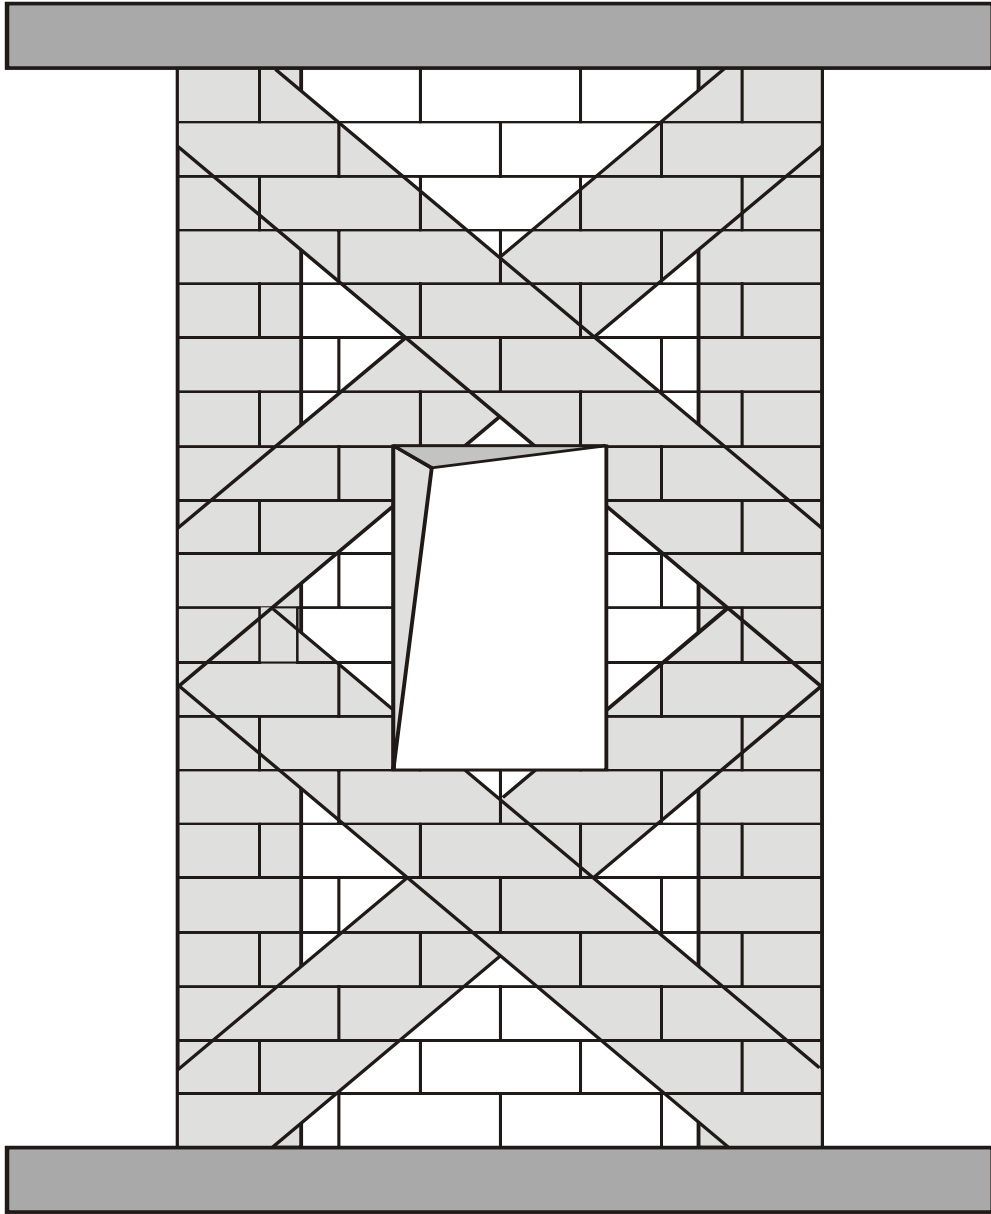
Retrofitting shape for the wall with opening with GFRP-sheets
